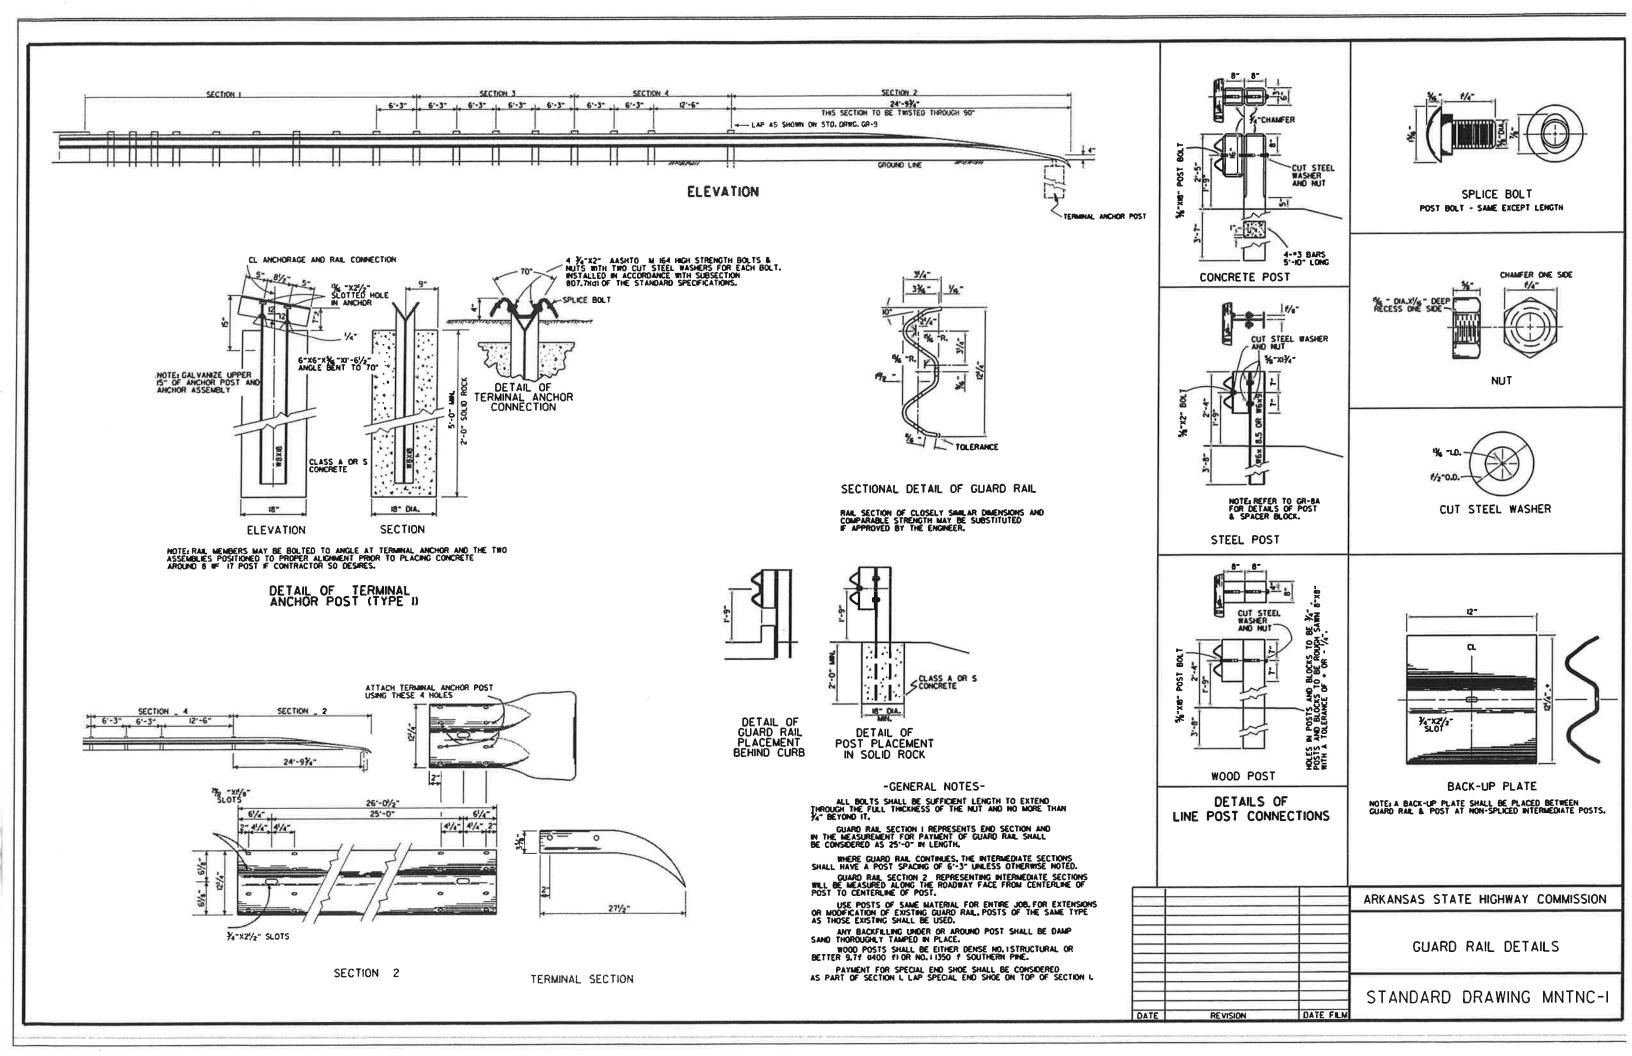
DETAIL OF TERMINAL ANCHOR POST (TYPE I)
